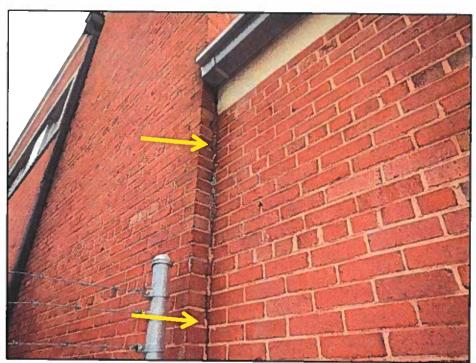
Large crack at Left wall, where the lower wall frames into the taller gymnasium space wall
